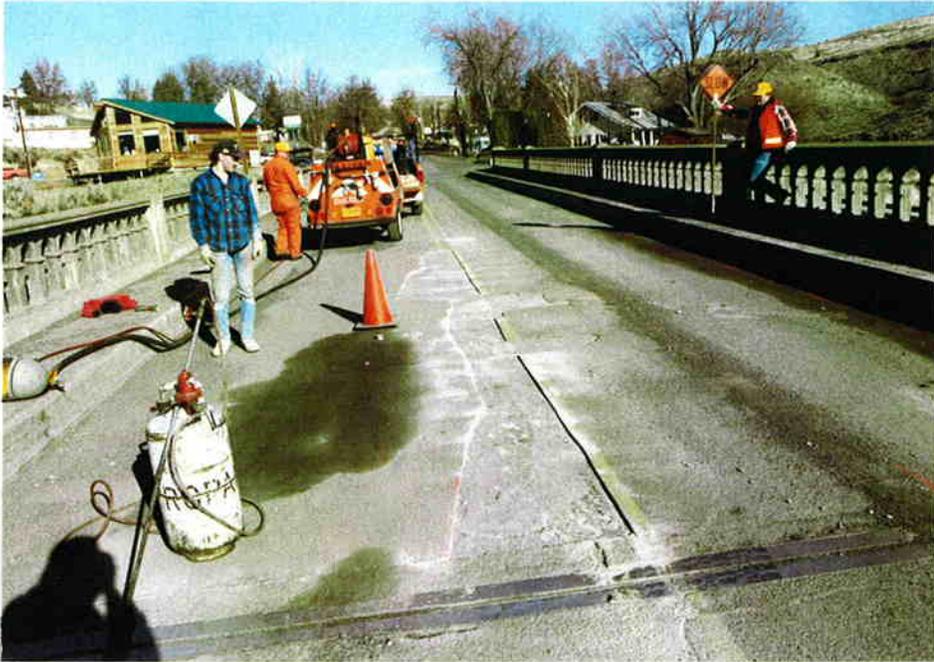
Delaminated Bridge Deck Prior to Overlay.
